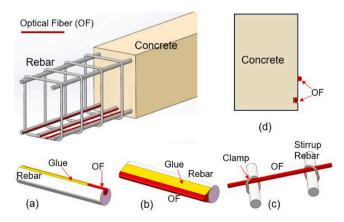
Optical fiber (or cable) integration with structure: (a) embedding into a precut slot on rebar; (b) surface continuous bonding on rebar; (c) point fixing with glue and clamps to stirrup; (d) glued on concrete surface or embedded into a shallow groove.
